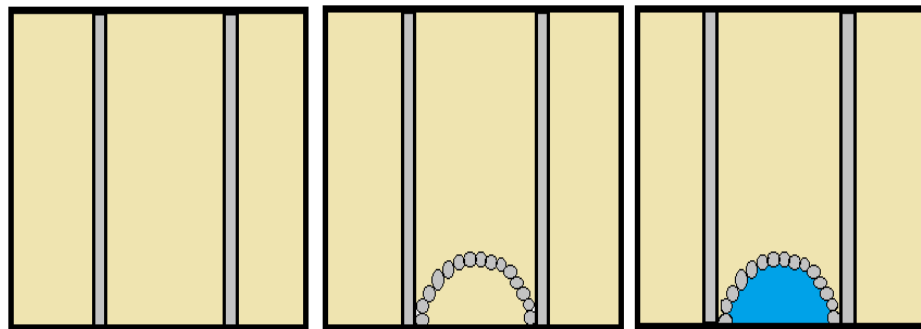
Description of the three construction steps of the new method: 1) Jet-grouting of the columns; 2) Sub-horizontal grouting of the shell; 3) Excavation
